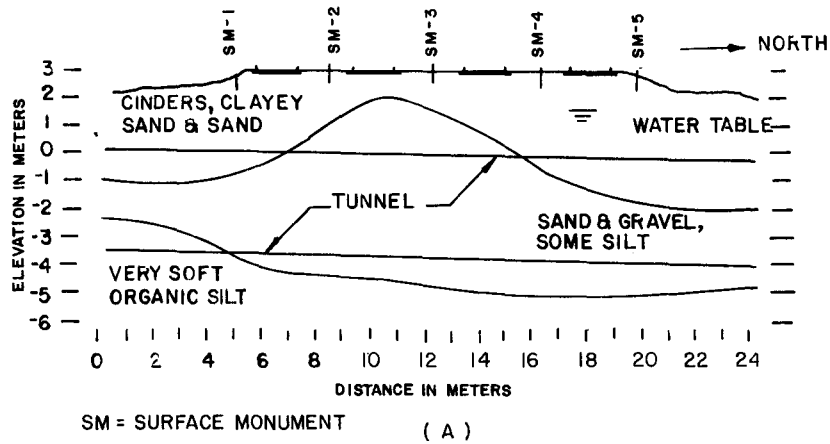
Subsurface Conditions and Tunneling Performance for the Washington Tunnel (Jones and Brown, 1979)
